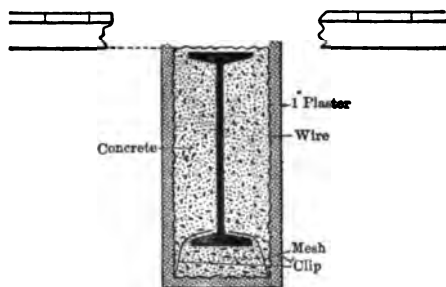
Fireproofing of Steel Beam with Concrete and Plaster
